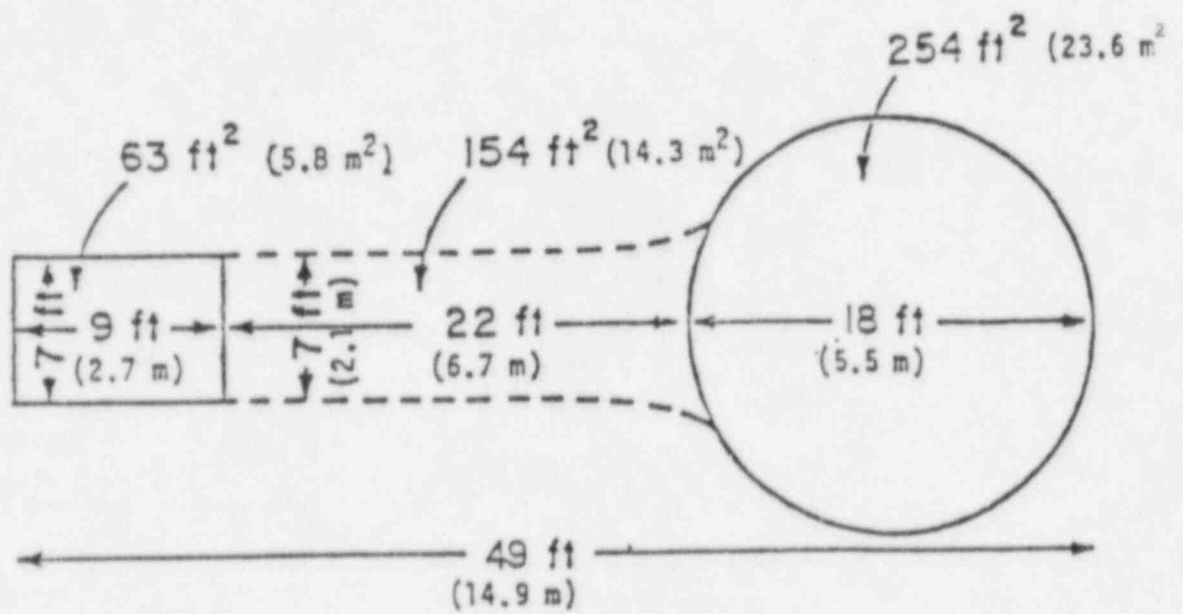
(b) - Plan view and typical dimensions of reactor cavity and keyway.
